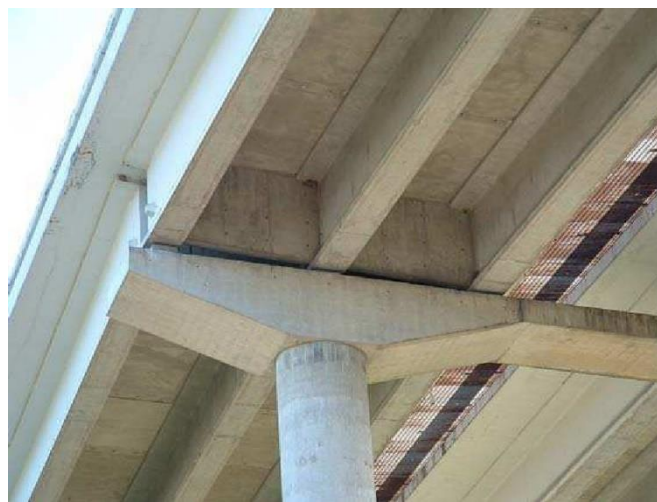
Example of the inverted T-beam girder viaduct (source: (Pircher, 2006))
